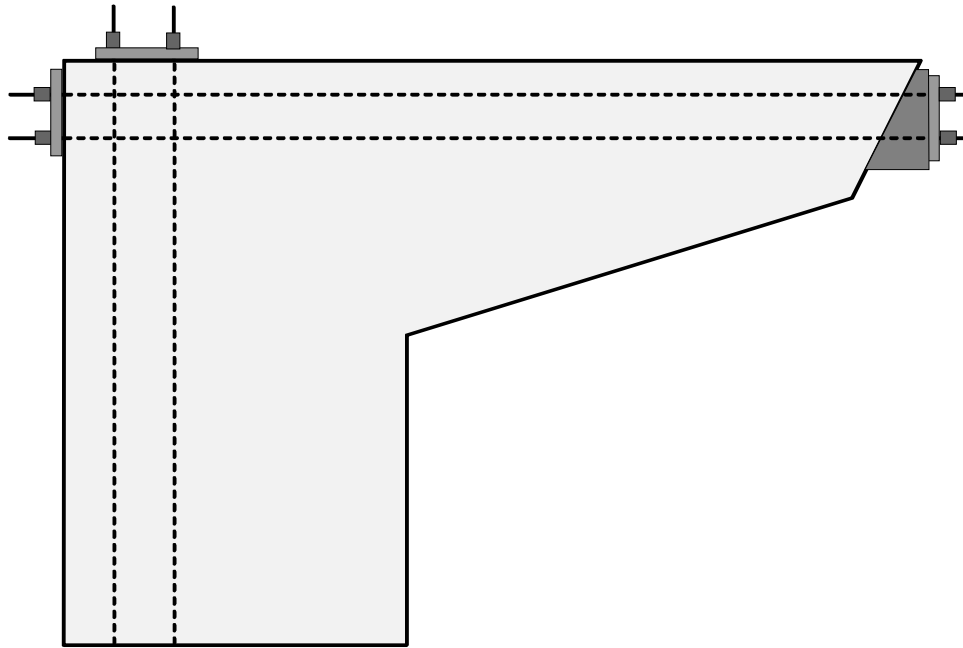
Schematic of Internal Horizontal and Vertical Post-Tensioning
